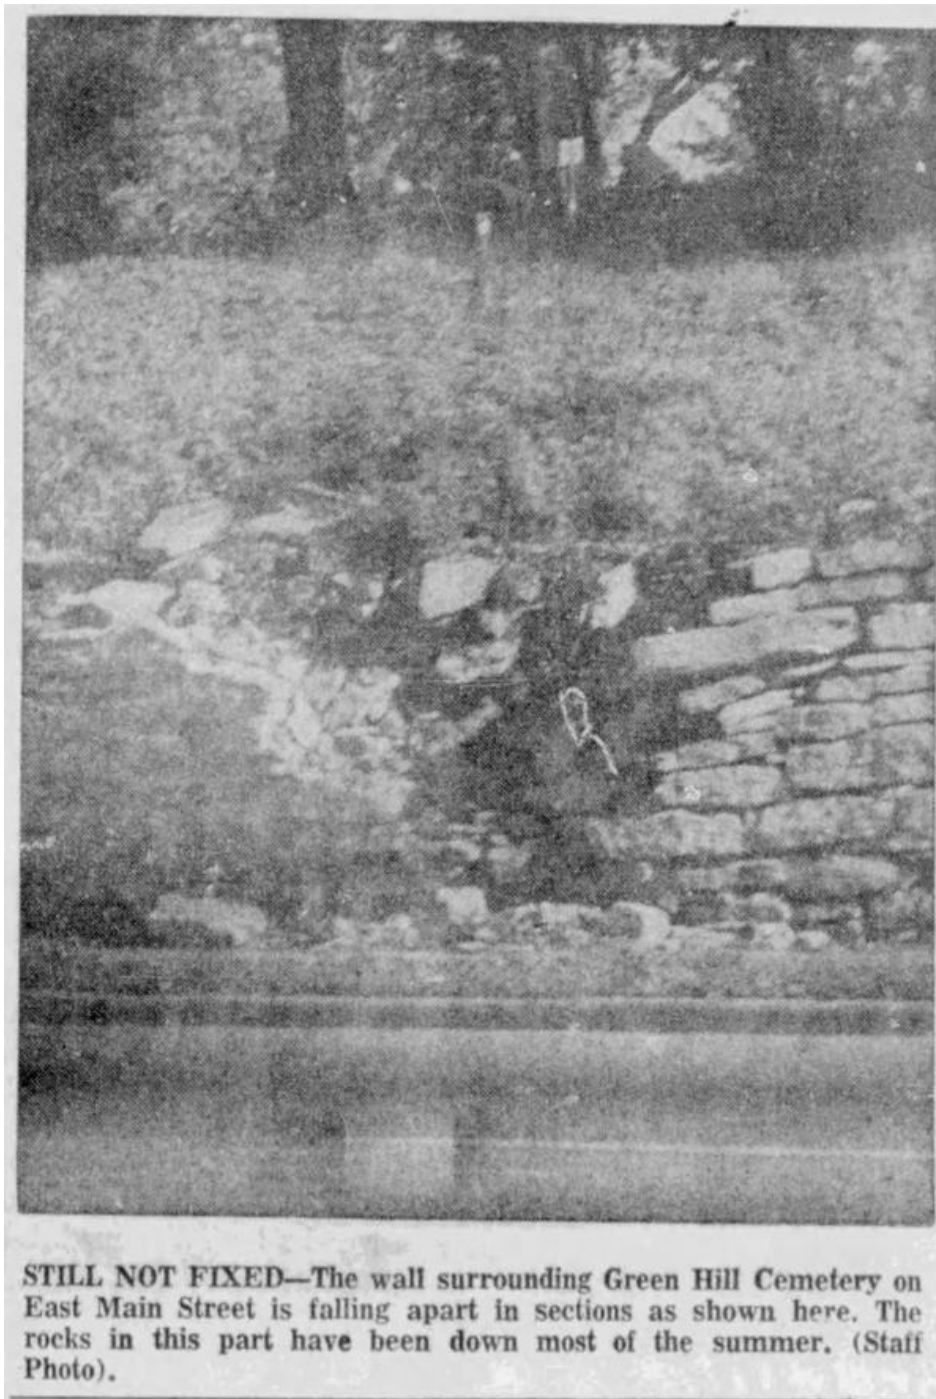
Photograph showing a collapsed section of the original stone retaining wall along East Main Street (U.S. 60) (Source: *The State Journal*, August 29, 1962:1).
